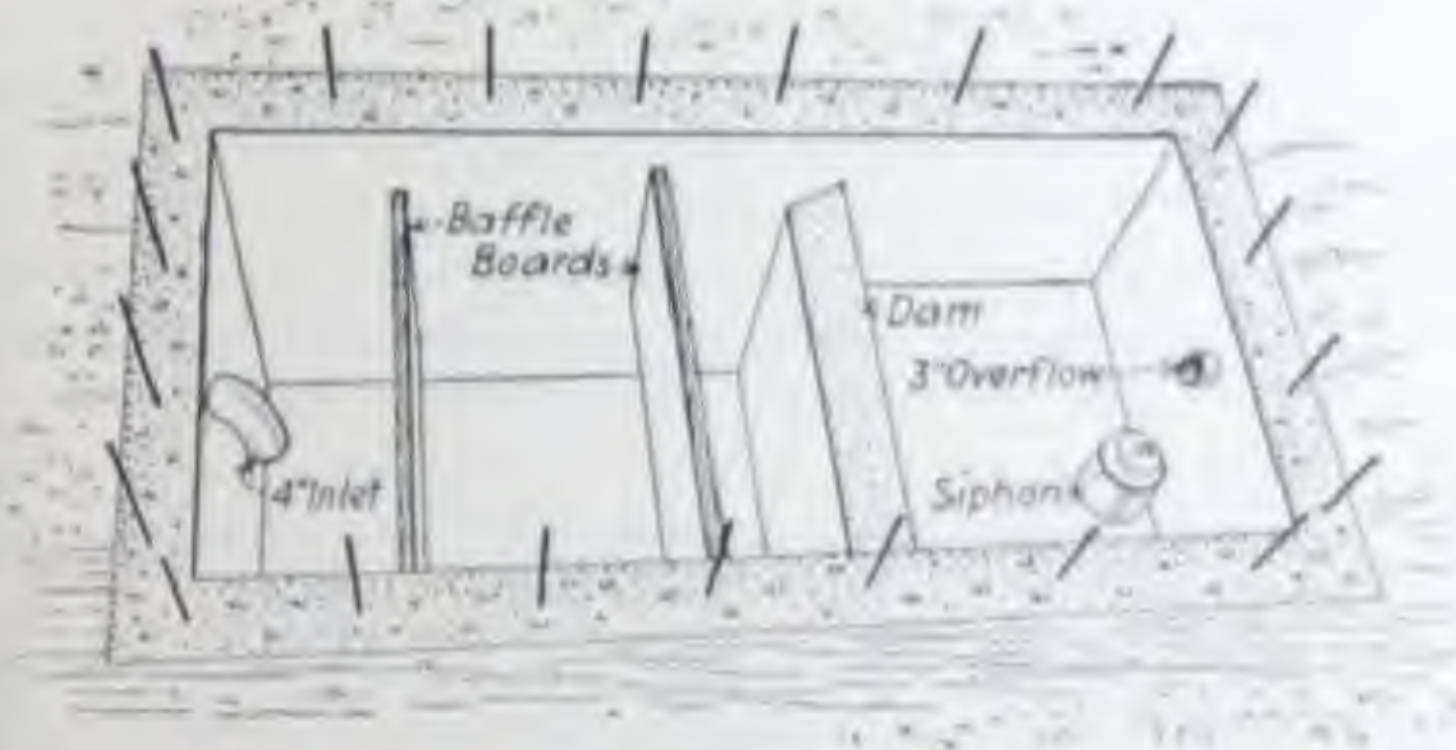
To the left—View of septic tank from above showing placing reinforcement, arrangement of inlet, overflow, dam and baffle boards.
